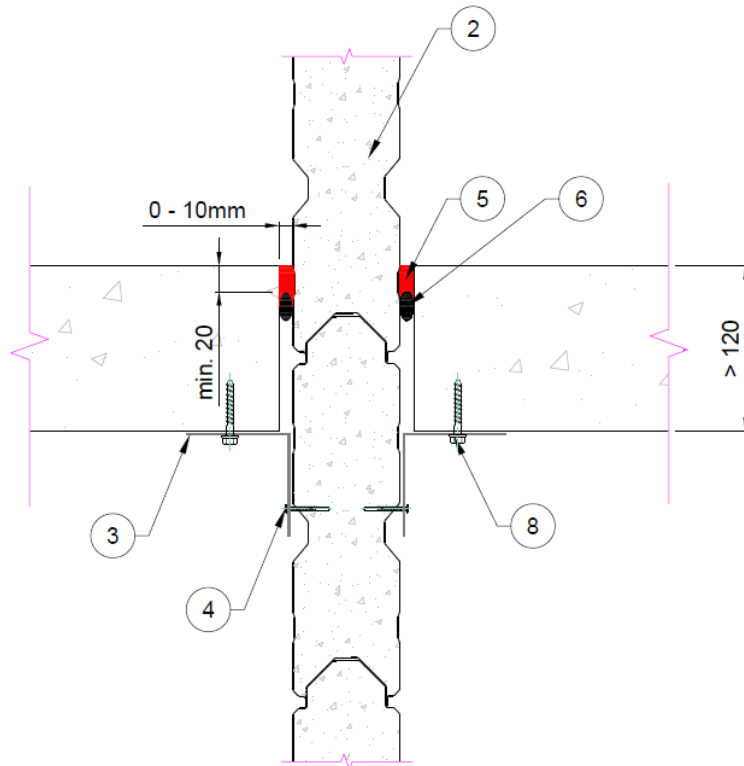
Wall-to-stair Joint (0-10 mm gap)
